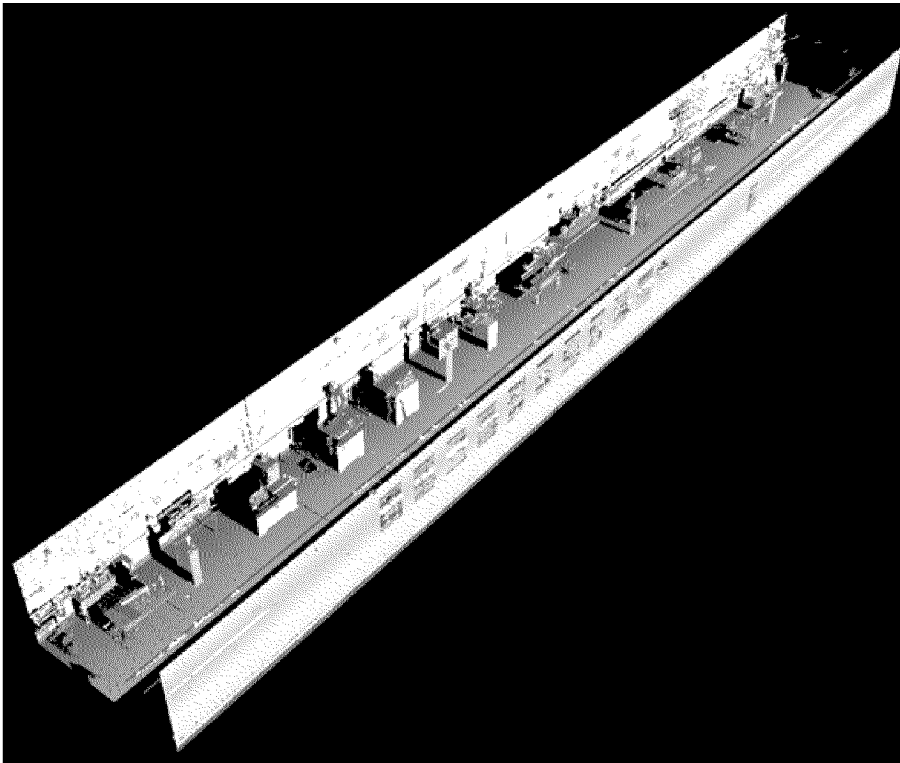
Point cloud of test tunnel based on kinematic surveying (outside view).
